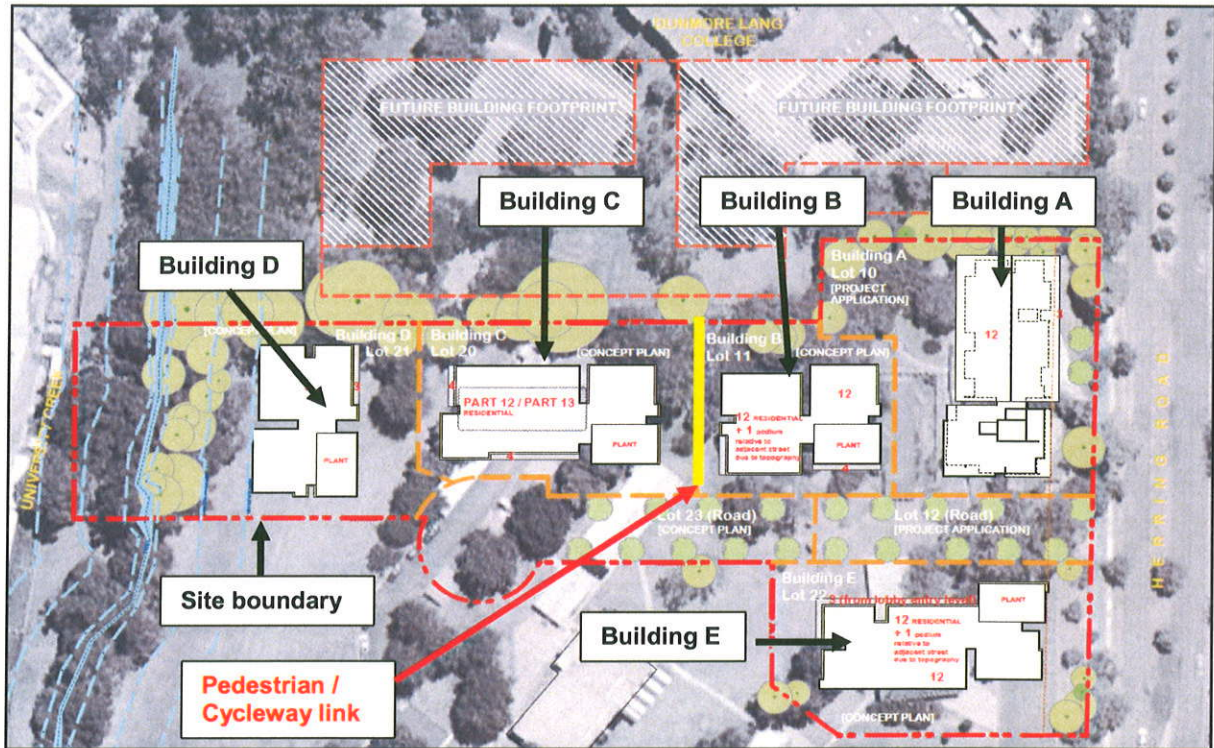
Site context plan illustrating the development layout with the pedestrian / cycleway link shown highlighted in yellow.
